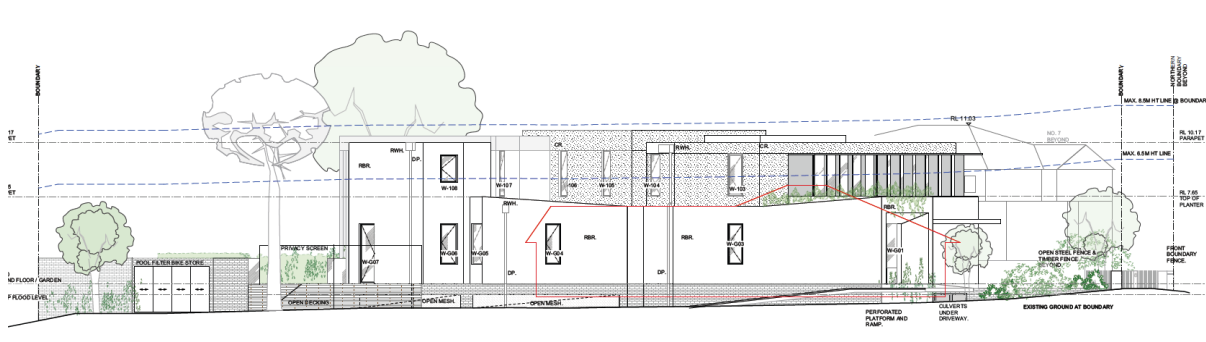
Proposed south elevation. The footprint of the existing dwelling is outlined in red.
